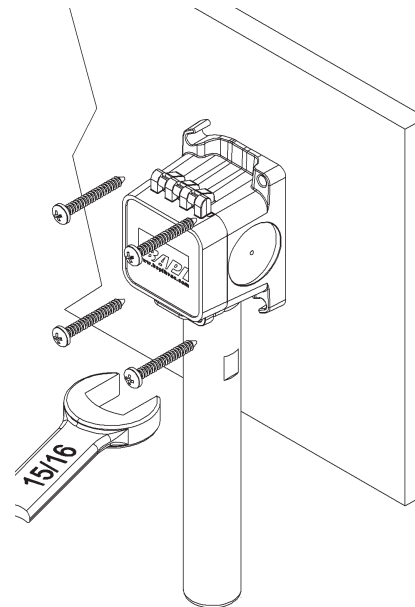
Thermobuffer in a BAPI-Box Crossover Installation
